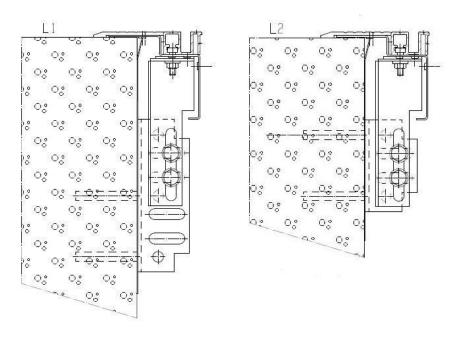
Sill types L1 and L2 (Sill type drawing 733804 1998).
